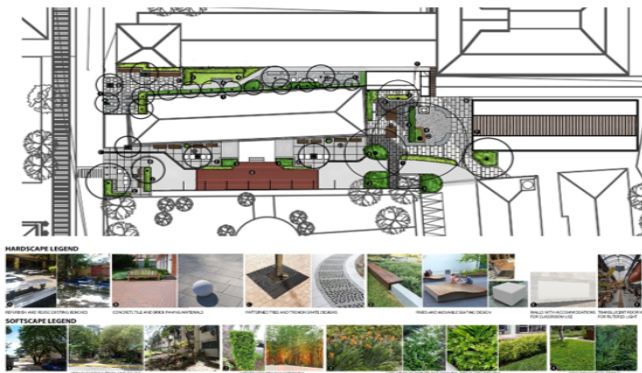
College of Law and Canteen Annex Plan and Material Concepts
